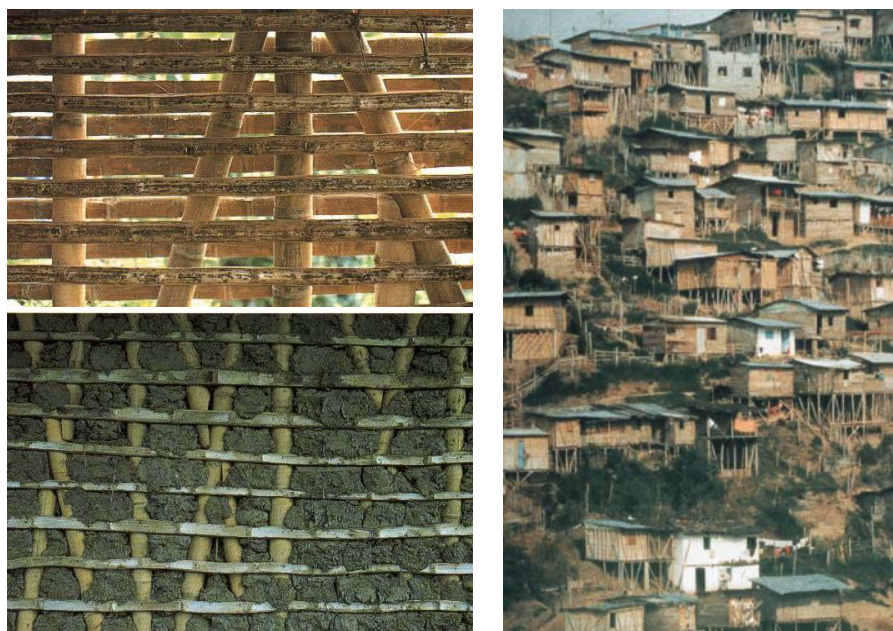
61 Bahareque for the wall construction (left. ref. Jörg Stamm) and a residential estate constructed from bamboo in Manizales, Columbia (right. Ref. ZERI Foundation)
